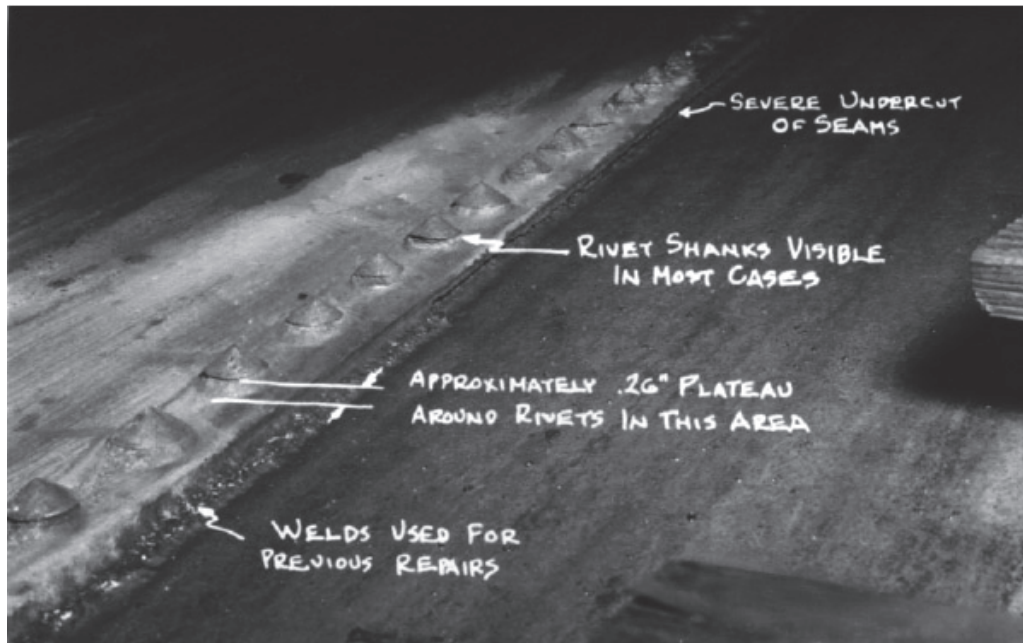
Localized Corrosion-erosion at Riveted Seam in a Tank Bottom
